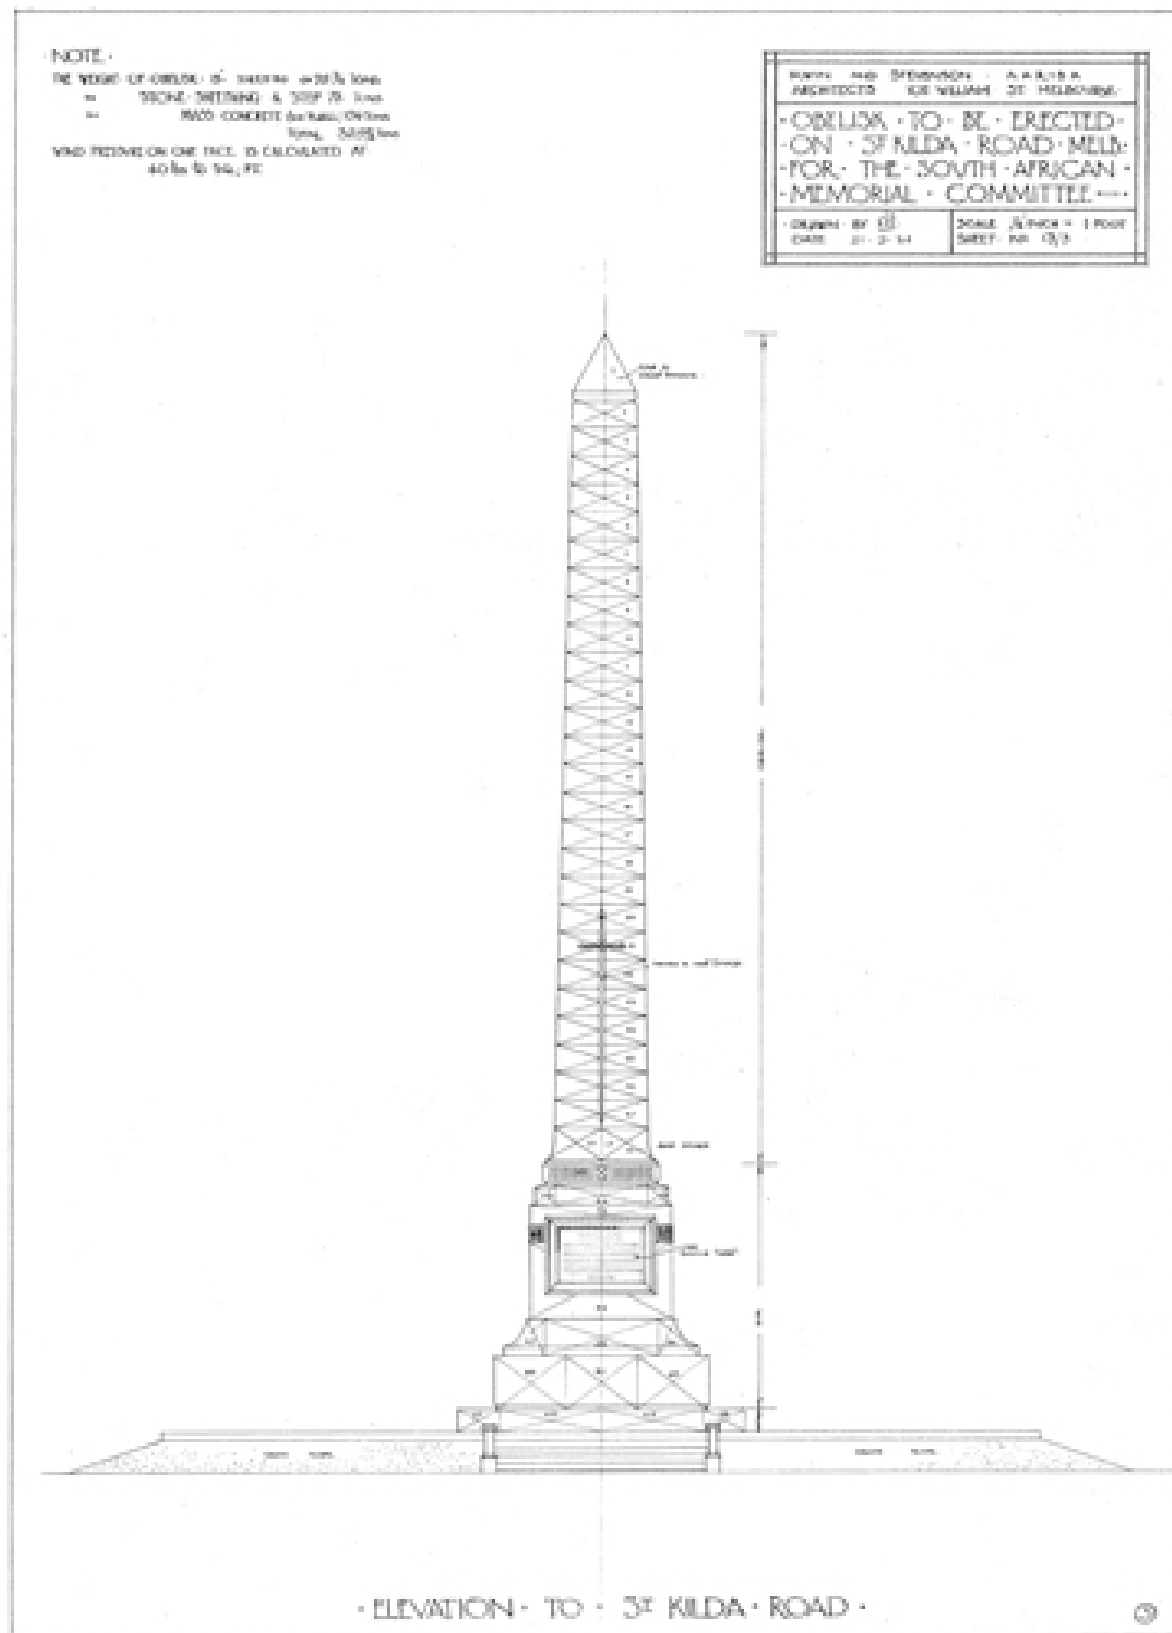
Drawing showing elevation to St Kilda Road, 1921 (source: Port Phillip City Collection, sm0414.1-2)
